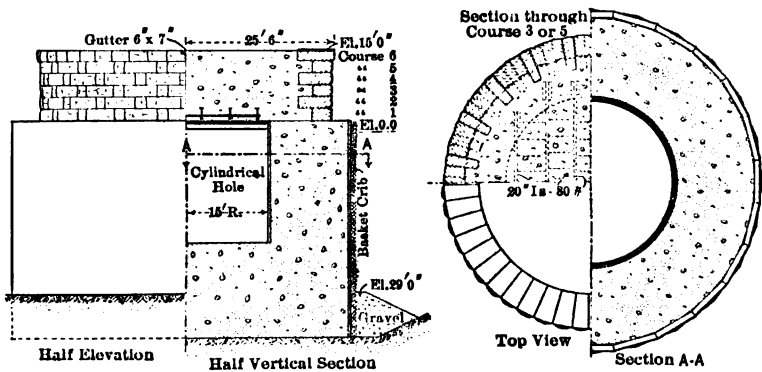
COFFER-DAM FOR PIVOT PIER, CHELSEA BRIDGE.
